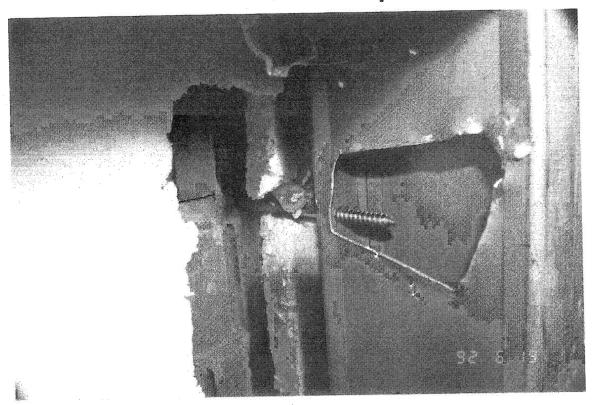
Interior View of Repair EXT4 Connection to Steel Stud
